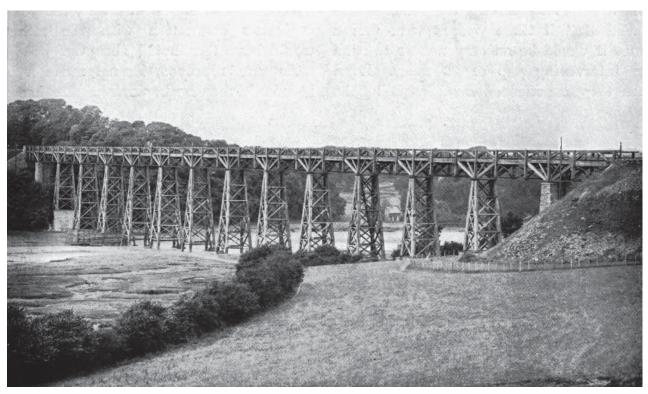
One of Brunell's timber viaducts in Cornwall, (Lewis (2007))
